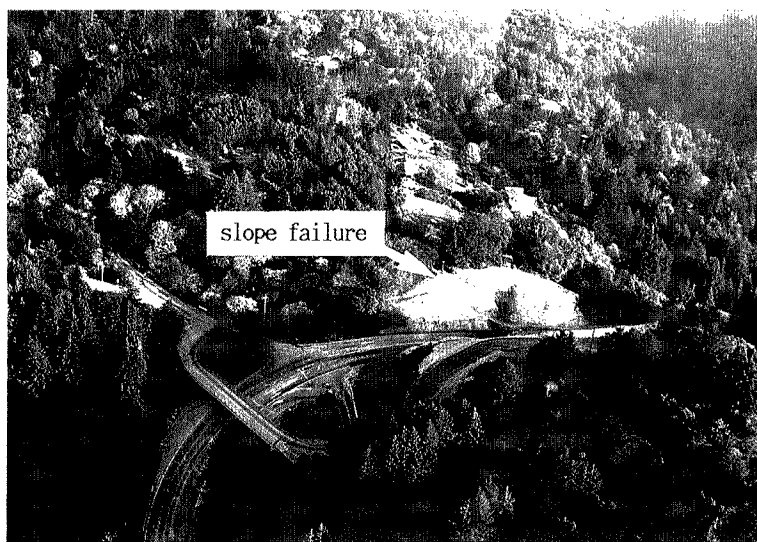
Slope failure on Hwy. 17 near Summit Road (photographed on 11/11/89).
